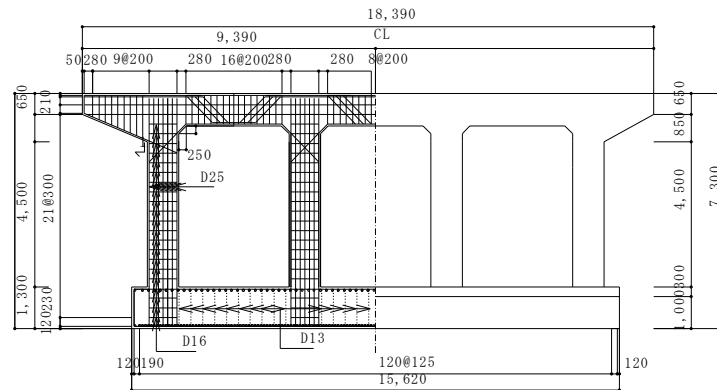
Re-designed reinforced concrete pier of a bridge (Okazaki, 2005)
